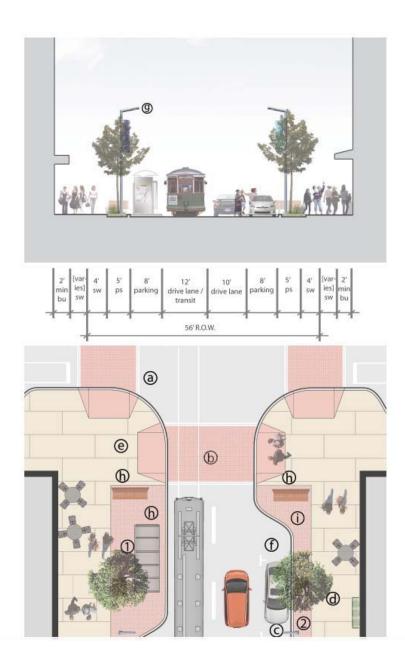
EXHIBIT ___F (Page 2 of 8) <u>Streetscape Standards</u>
